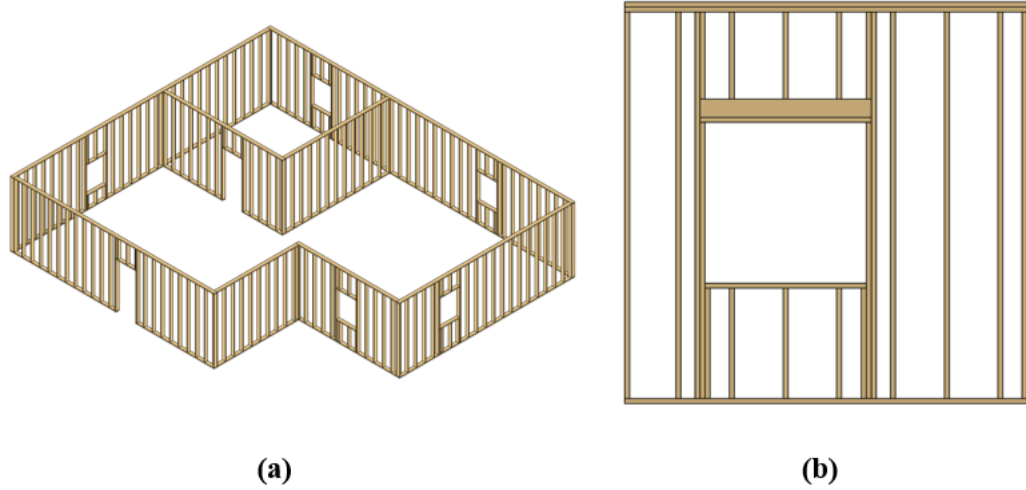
(a) BIM model of a partial residential house, and (b) typical wood frame used for residential building construction.
